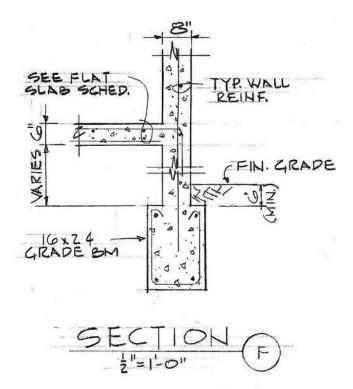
Long Term Care Wing – Foundation Dowels (Section F/S-3)
